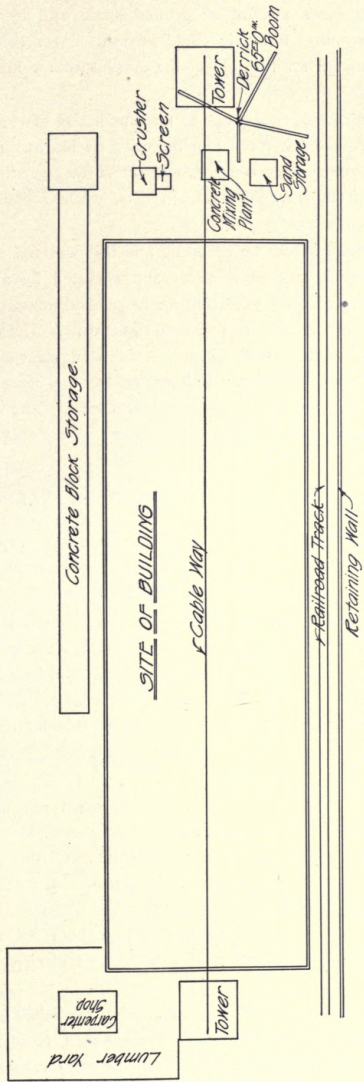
Plan of Construction Plant. (See p. 110.)
